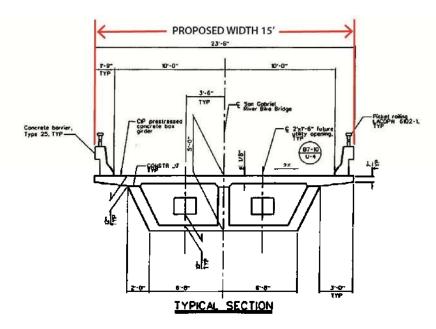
Typical section detail from the DPW's construction documents for the San Gabriel River Bridge.
